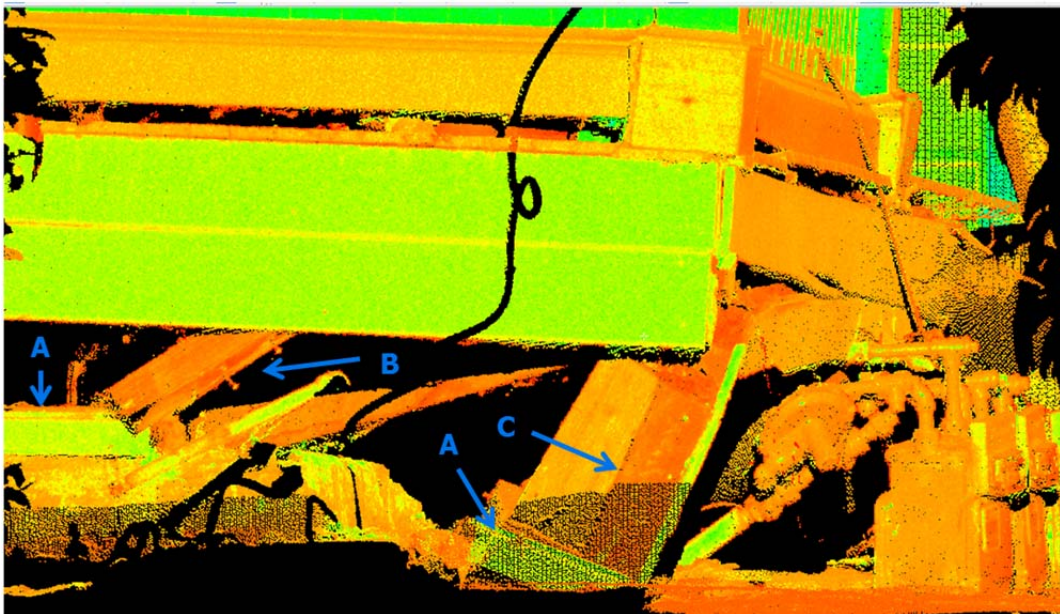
Major structural members of the building: A – sill plate, B- stud, C – corner 4 in. × 4-in.
